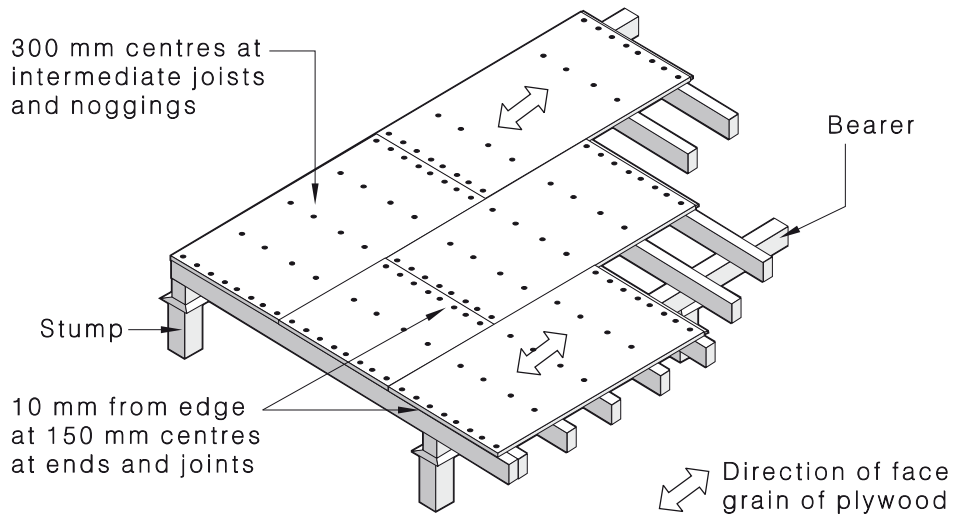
FIXING OF PLYWOOD SHEET FLOORING
